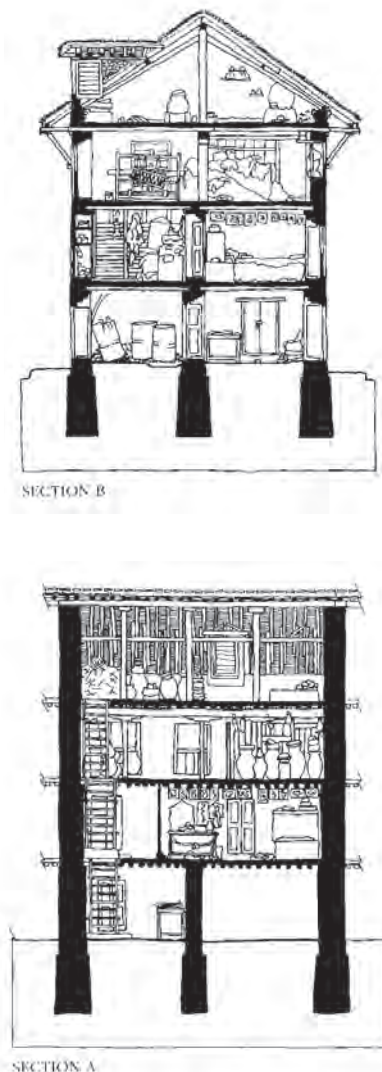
Section of traditional newar house ('Satungal', "4 VILLAGES: ARCHITECTURE IN NEPAL")
